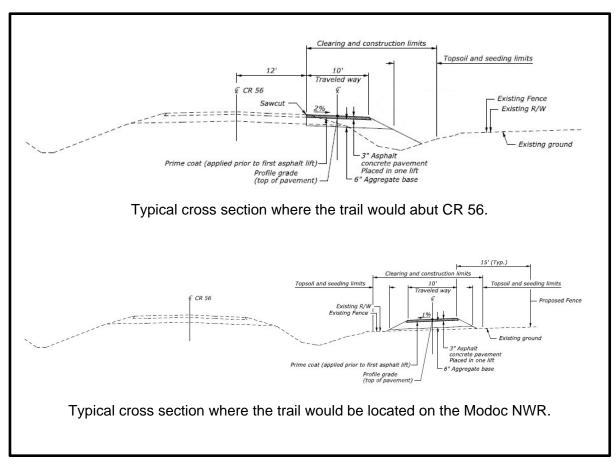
Typical Cross Sections of the Proposed Multiple Use Trail
